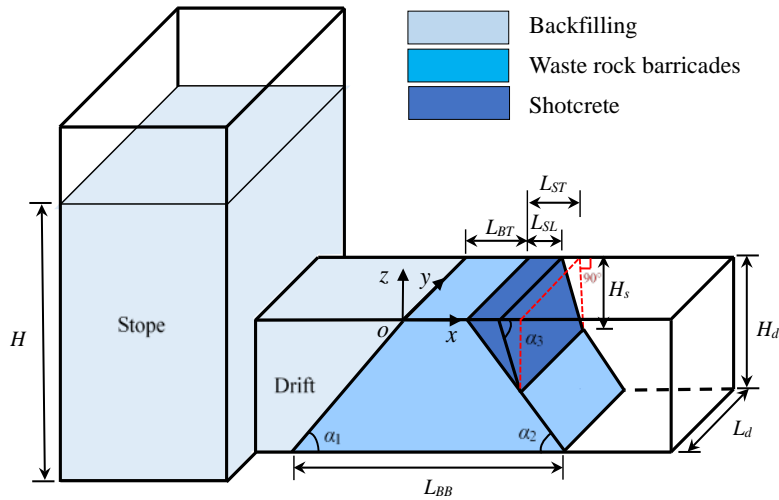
Schematic view of a backfilled mine stope with an access drift and a trapezoidal WRB reinforced by shotcrete (adapted from Li and Aubertin 2011).
